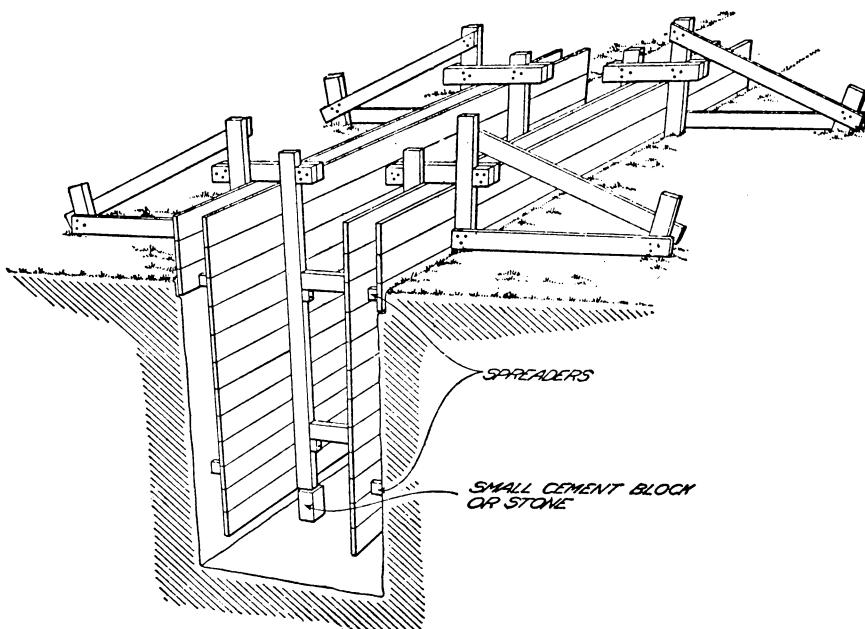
Section of trench for concrete vat with perpendicular sides, showing forms in place and another method of bracing.
